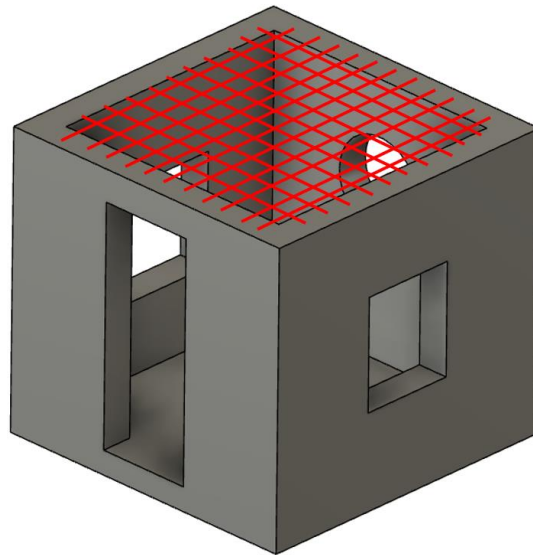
Mesh for raised slab on which the concrete is to be printed
